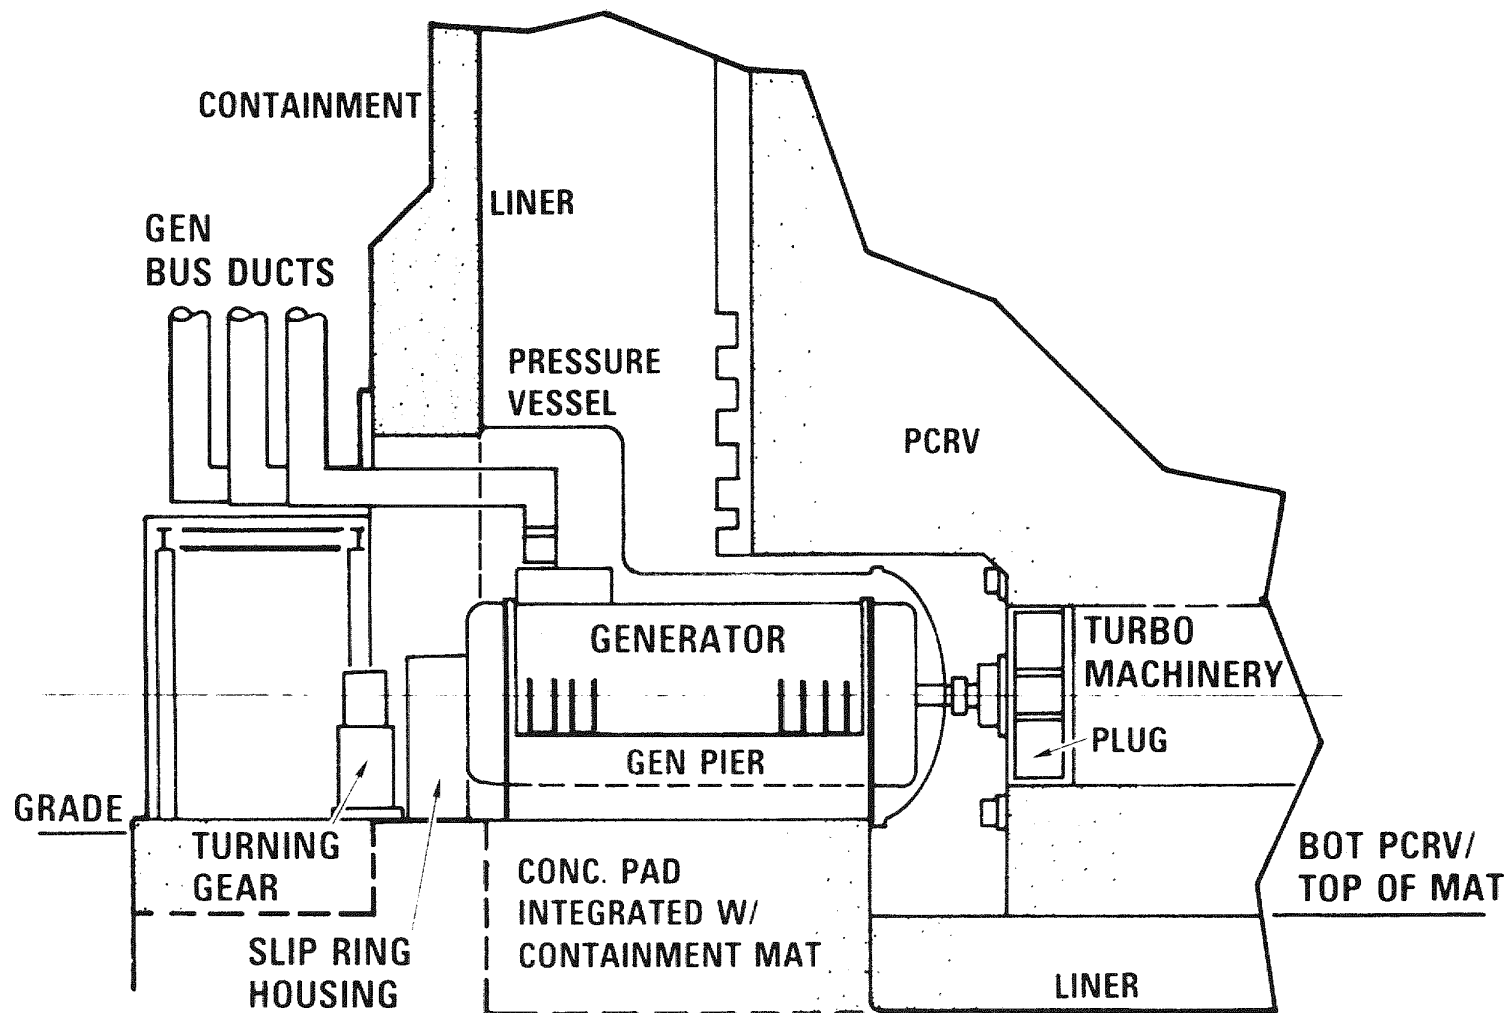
Generator enclosure for integrated GT-HTGR plant
